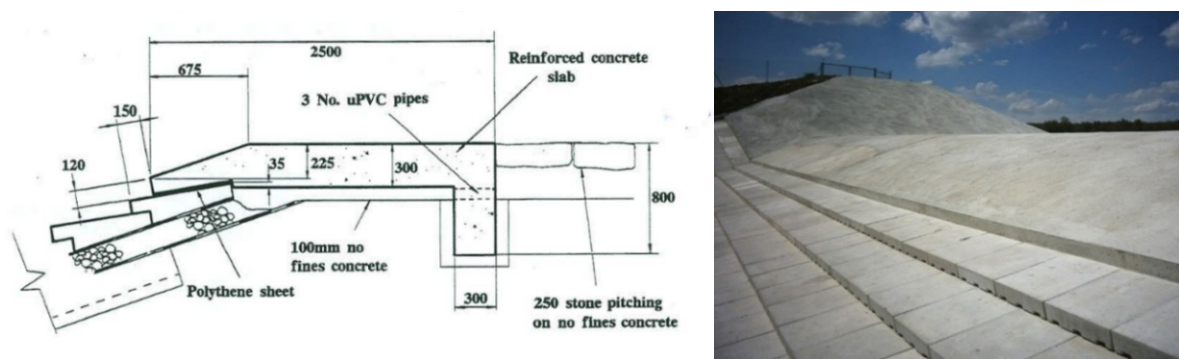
Left: Cross-section of the inlet structure of the Brushes Clough Dam. Right: view from downstream of the inlet structure of the Barriga Dam.
